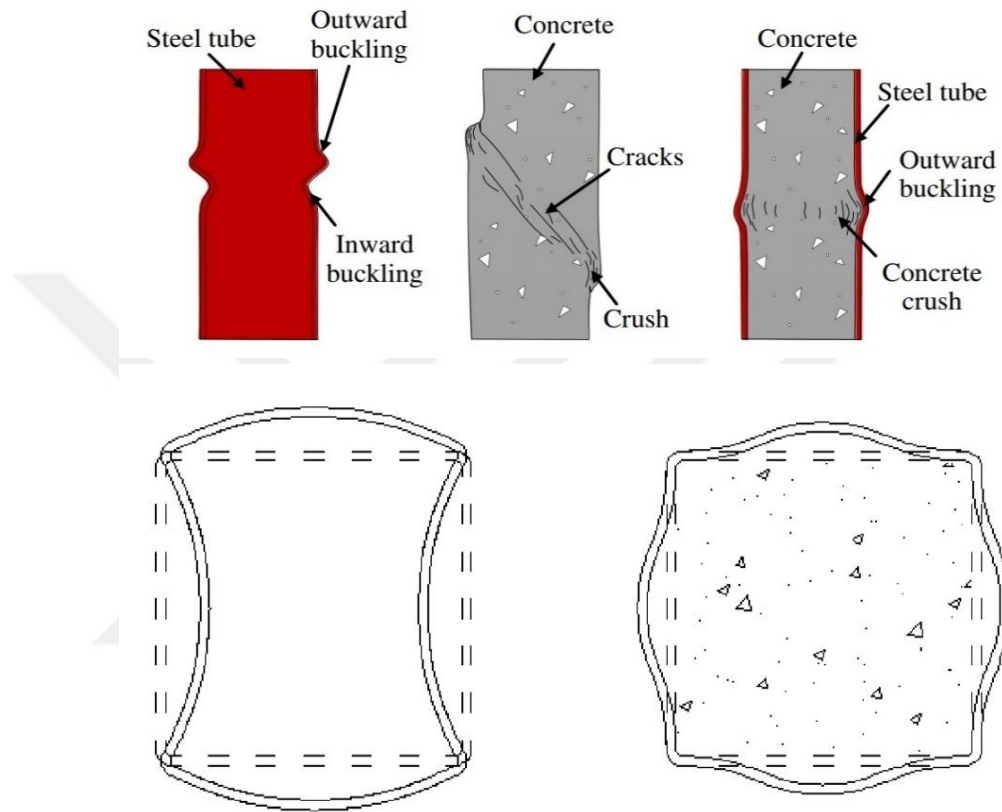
Buckling modes of a square hollow steel tube, concrete and CFST section with their top views below [20]
